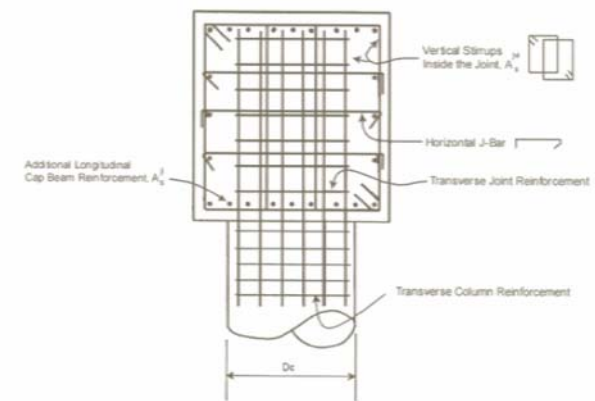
Joint Shear Reinforcement Details
